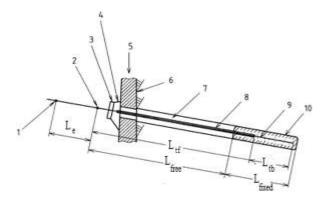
Sketch of aground anchor (after EN-1537, 2000).
